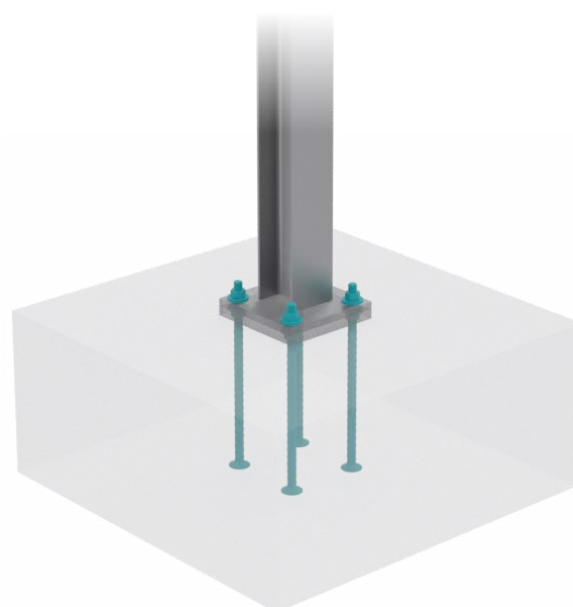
HULCO® Anchor Bolts in a steel column to base column connection.
